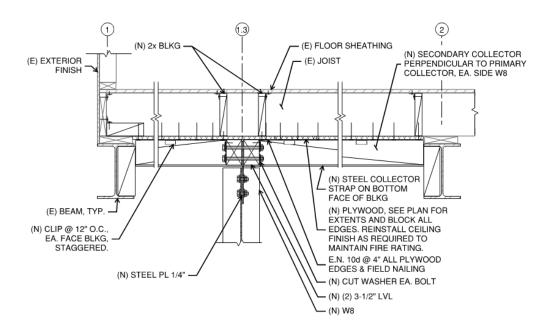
Wood-structural-panel soffit on underside of second-floor framing with secondary collector shown.
